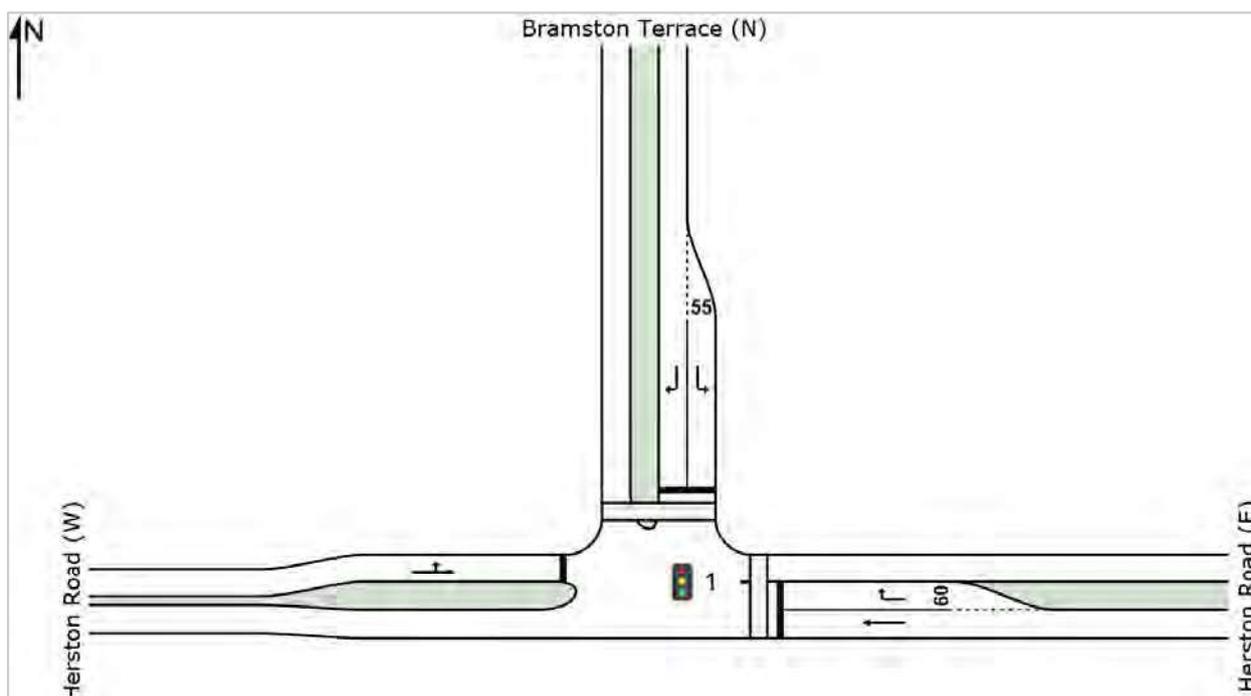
Assessed SIDRA Layout – Intersection 5
